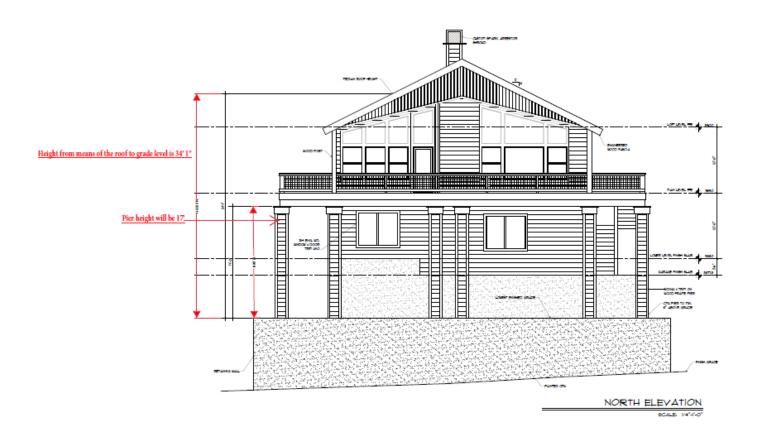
Revised North Elevation (reflects Planning and Zoning Commission recommendation)
